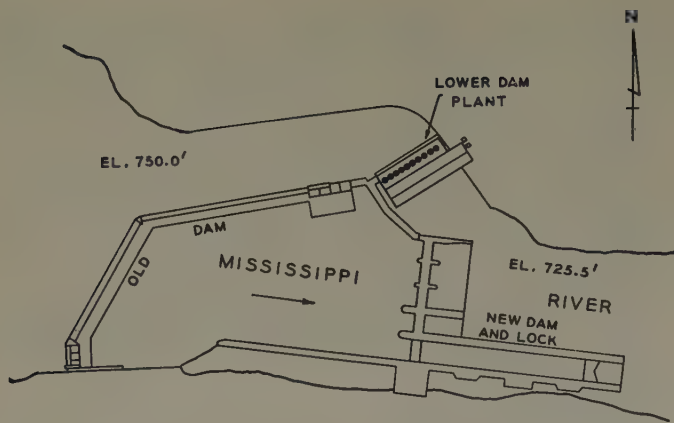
Plan of plant site, old dam which will be removed, and new government dam and lock
